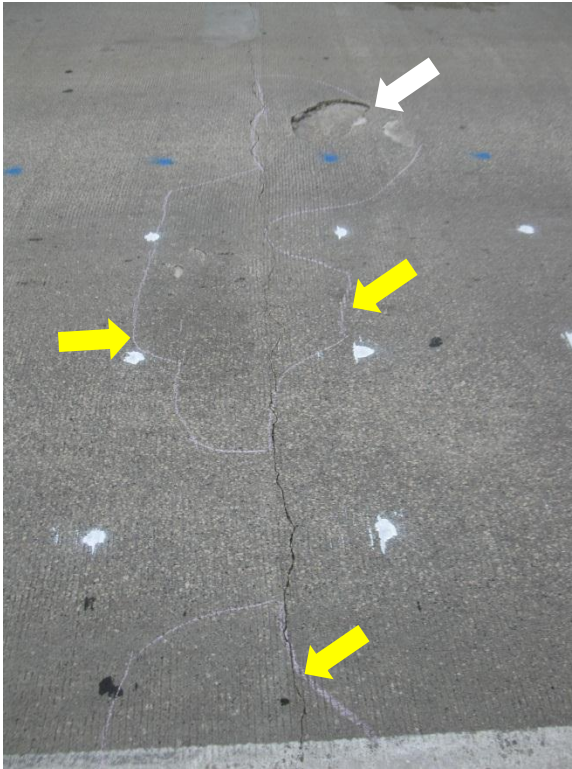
Typical delamination (highlighted with chalk) of concrete at a crack. Surface spalling is also visible (white arrow).
